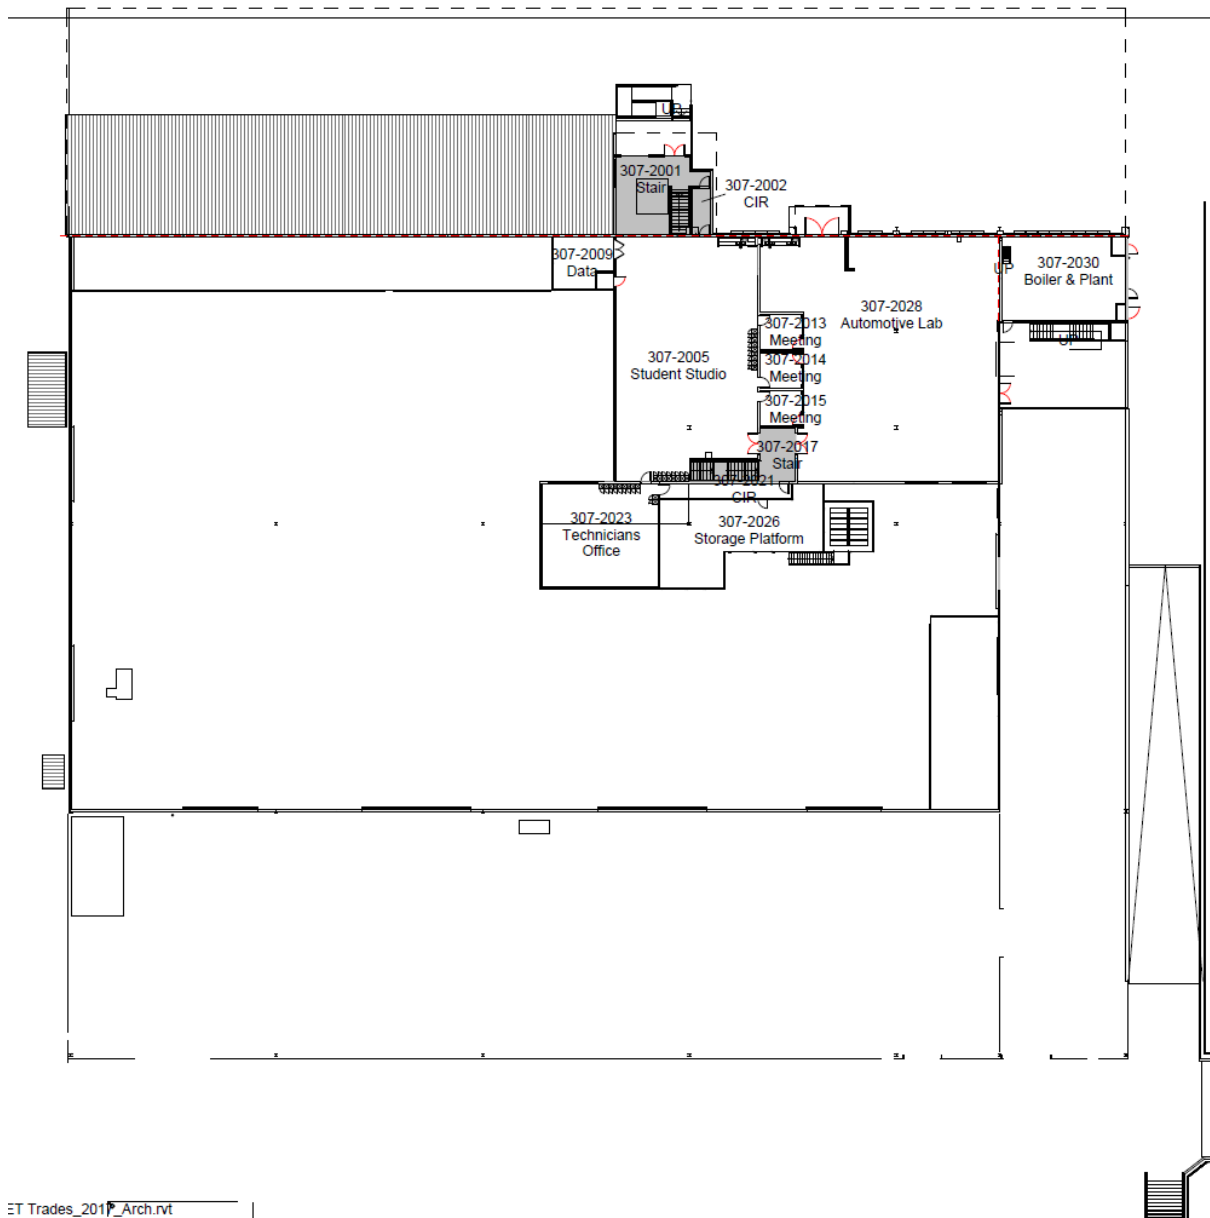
Mataaho B304 - Level 2 floor plan (Dimyadi, 2014b).
